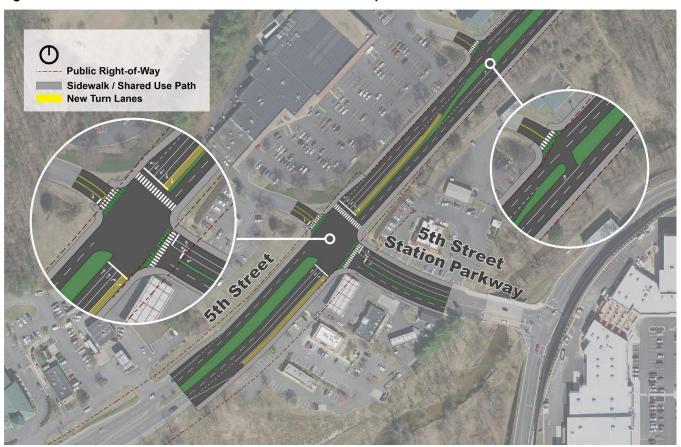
Intersection Expansion of 5th Street and 5th Street Station Parkway
